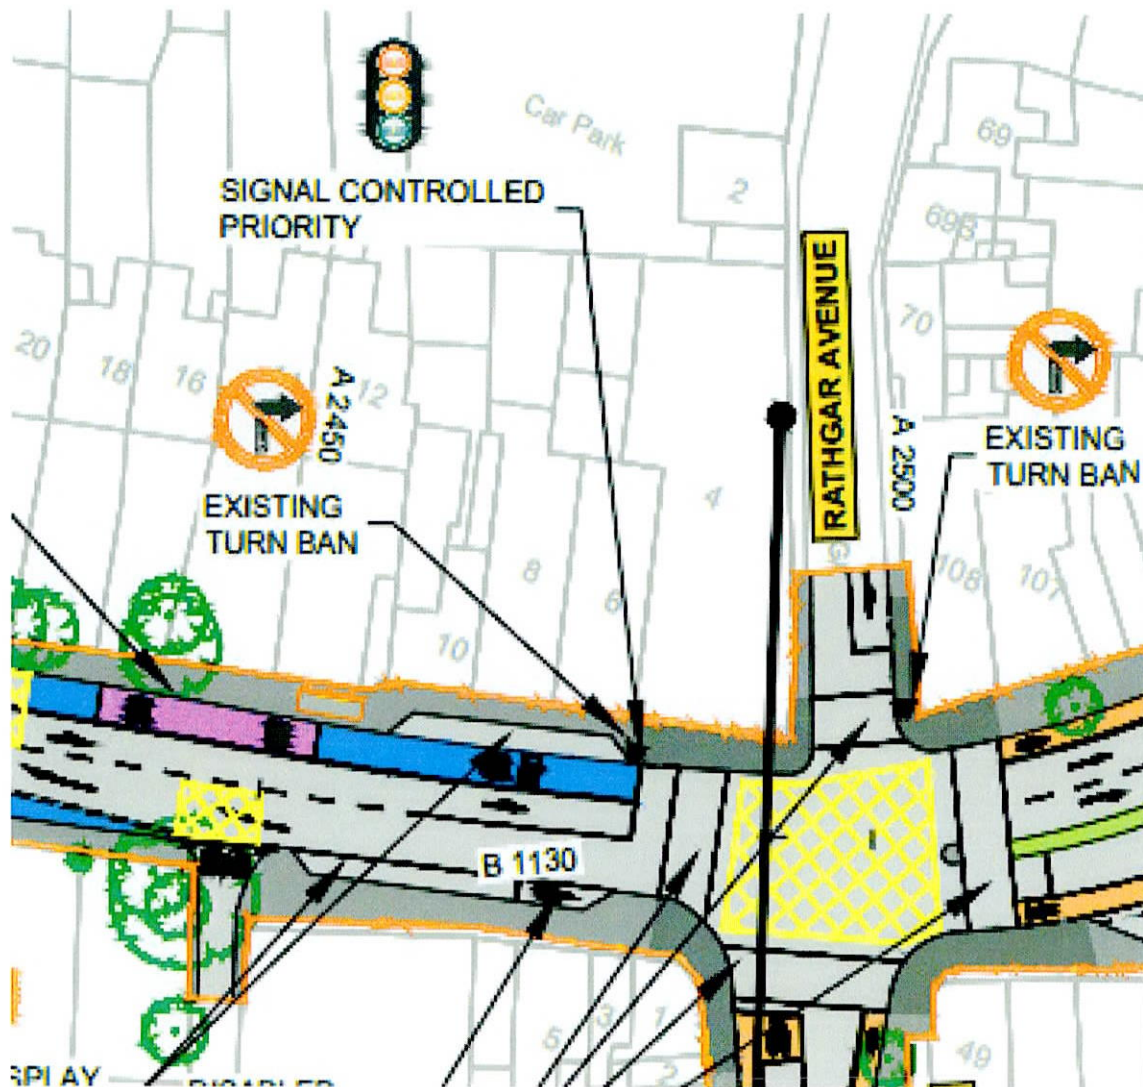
Extract from Sheet 10 of the General Arrangement drawing illustrating the intersection of Terenure Road East and Rathgar Avenue/Orwell Road.
